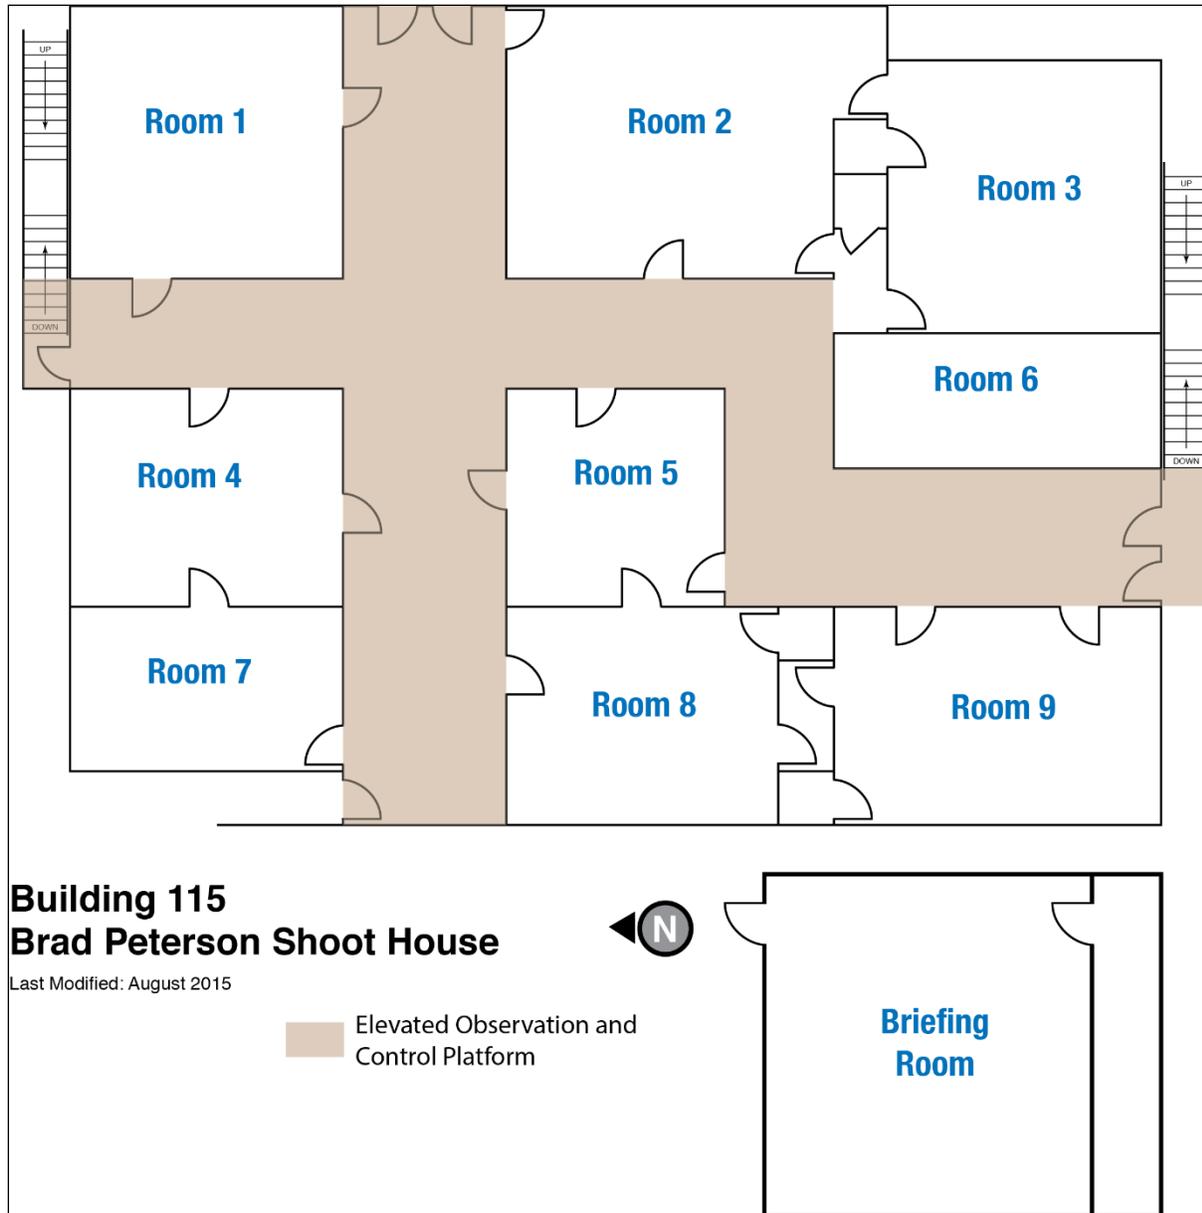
Layout and Features of NTC Live Fire Shoot House, Building 115
